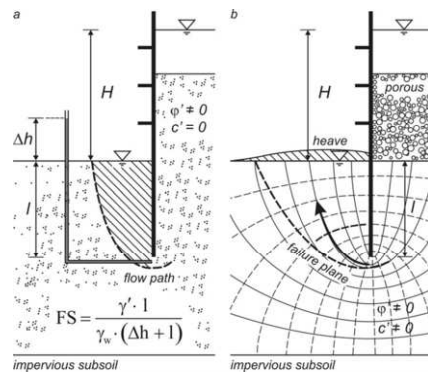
Hydraulic heave in: a – non cohesive soil, b – cohesive soil (Wudtke and Witt)
